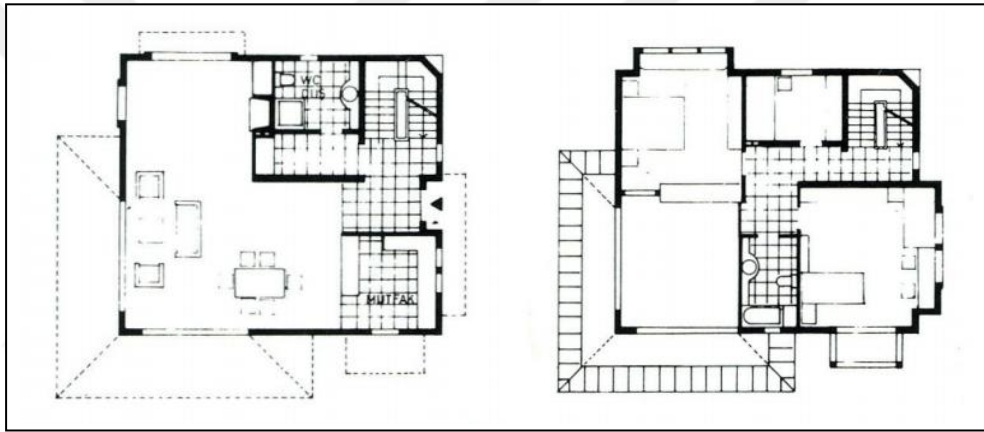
Floor plans of Bayramoğlu houses type 2 (Gorbon and Dinçer, 1989) [93]
